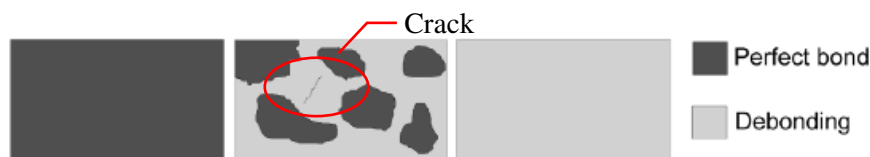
Inhomogeneous bond between contacting layers can affect shrinkage and cause cracking of newly cast concrete (extracted from [33]).
